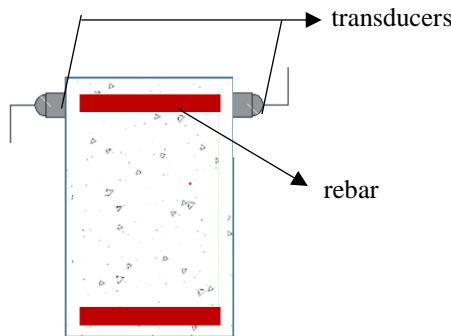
Cross-section of reinforcement concrete with rebar parallel to transducers
